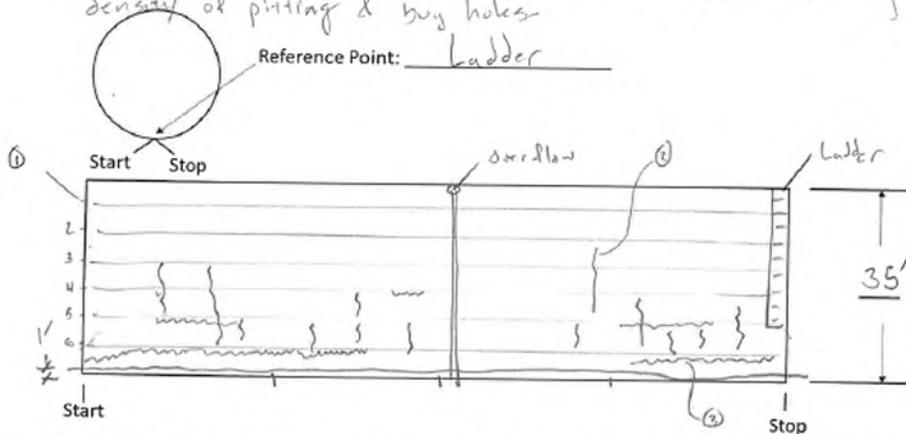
Reservoir EXTERIOR WALL Elevation– Note location of ladders and other features.
